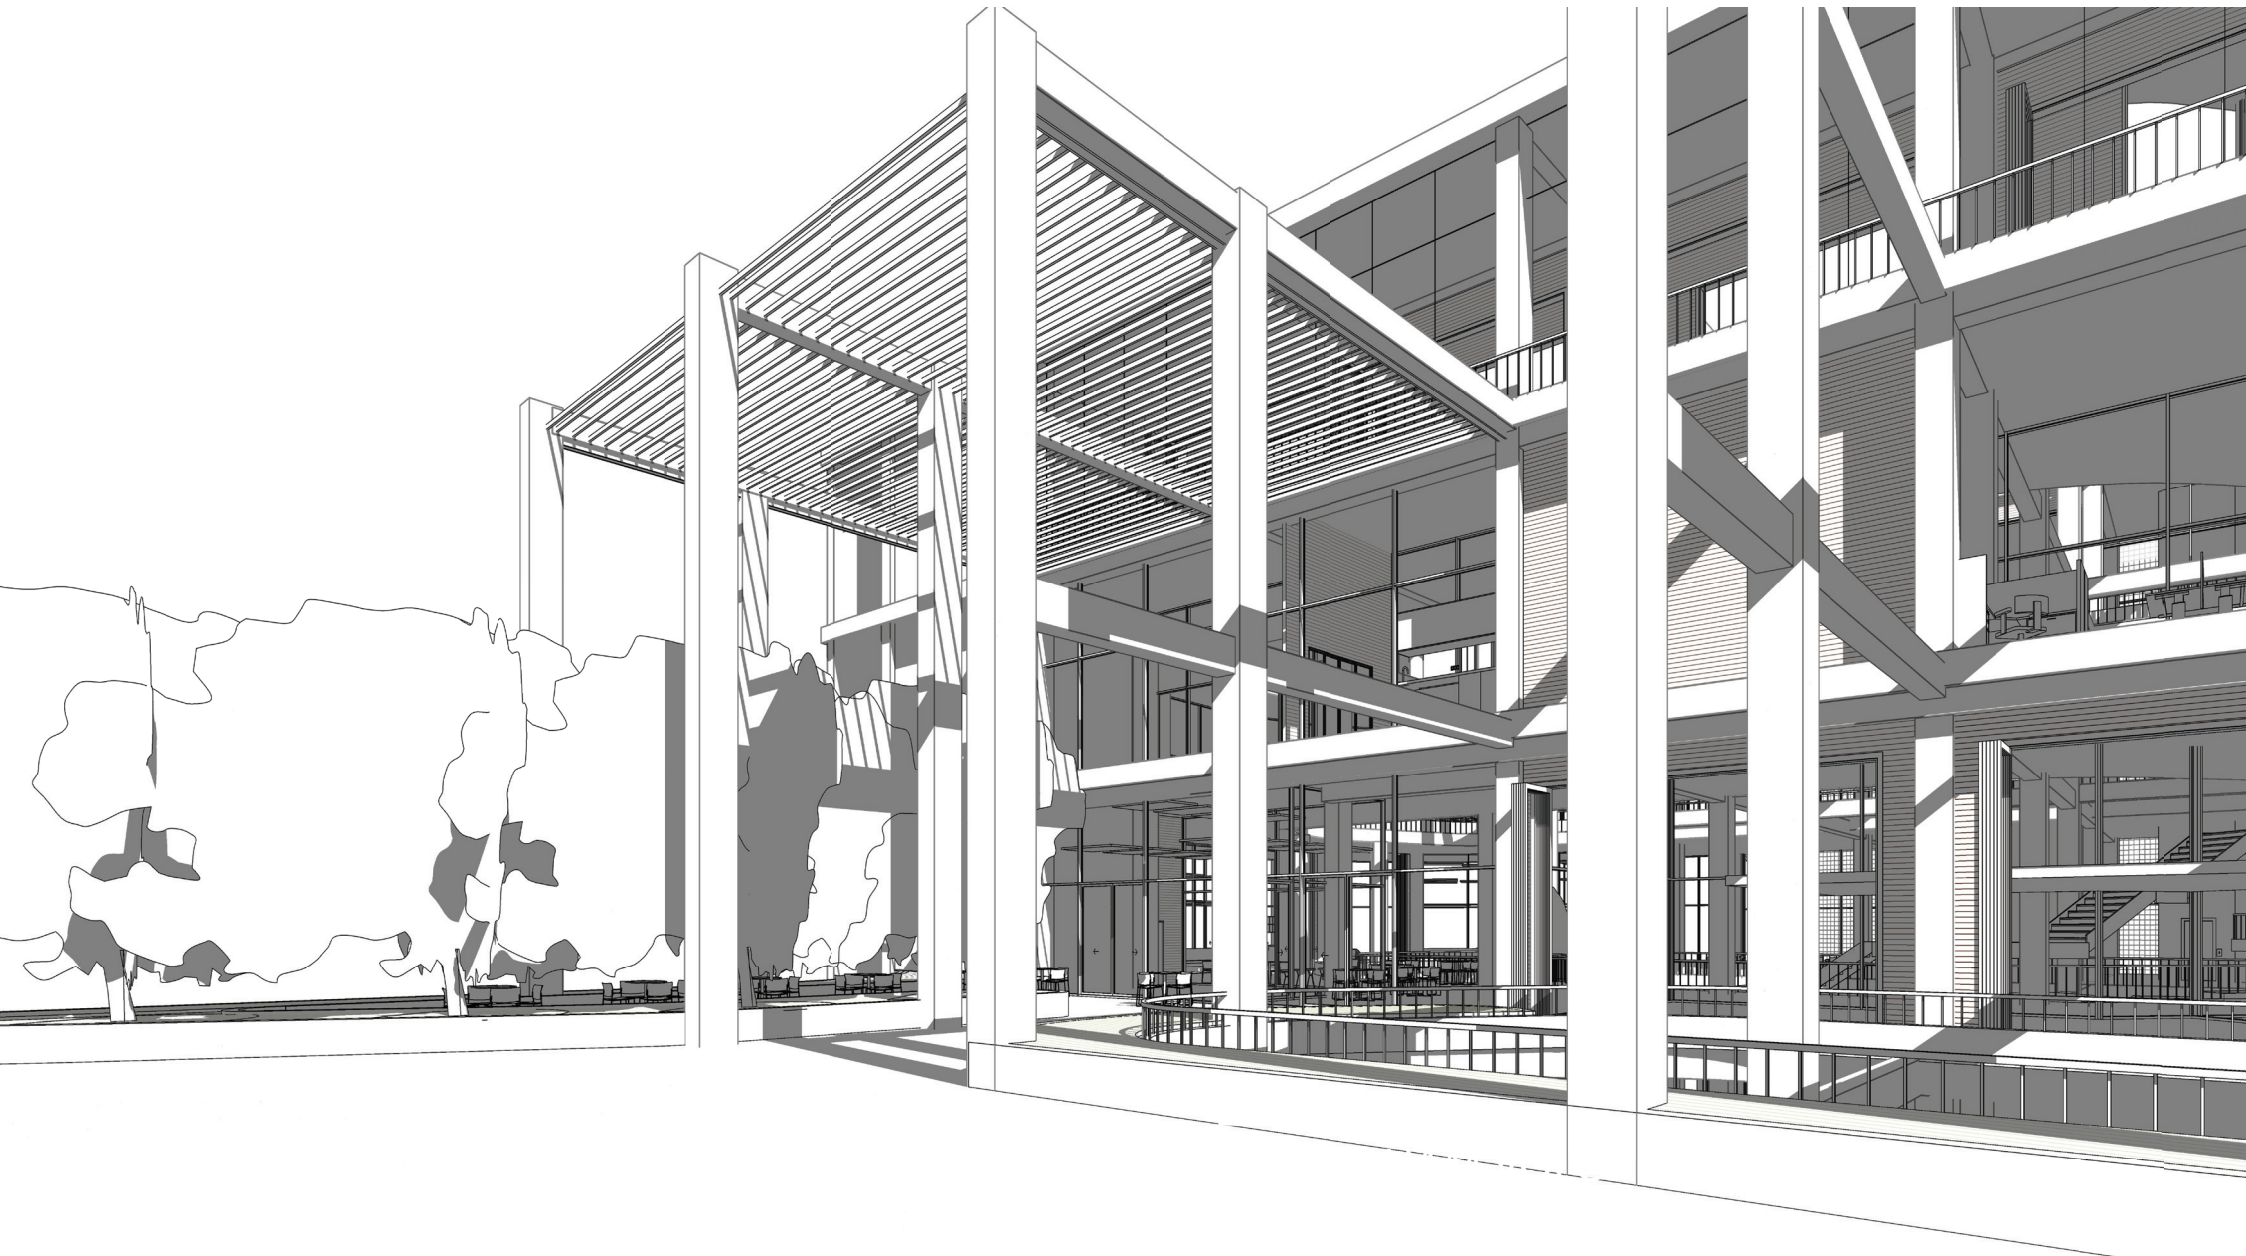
FIRST FLOOR EAST ENTRANCE (AUTHOR 2021)
